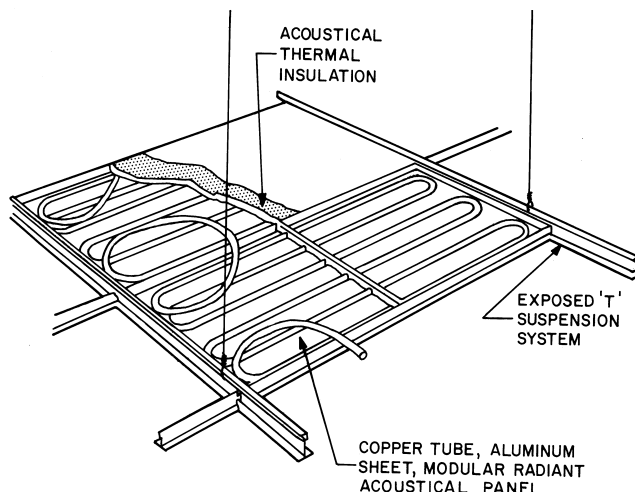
Metal Ceiling Panels Metallurgically Bonded to Copper Tubing
